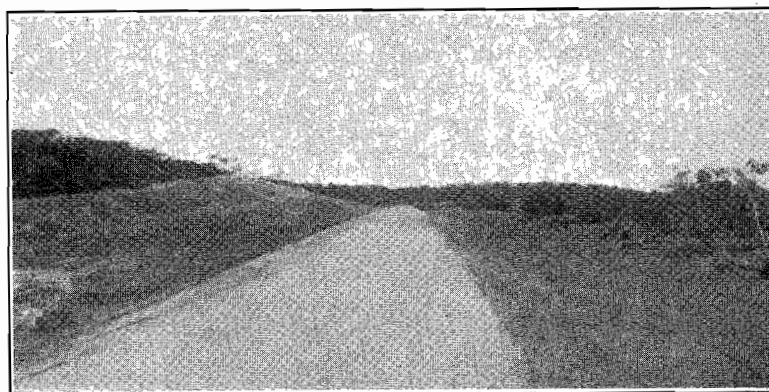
Showing limestone rubble road constructed near Hattah.
